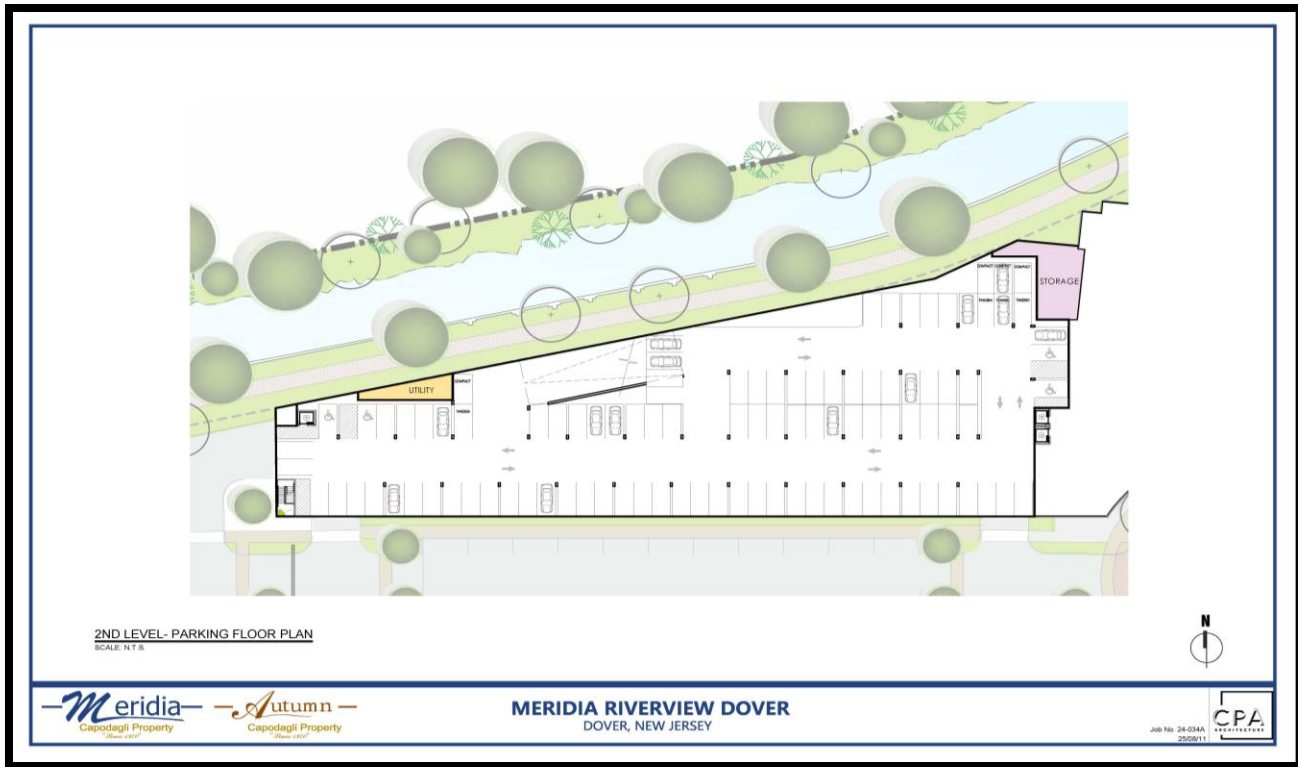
Conceptual Site Plan Building Phase 2: Below Grade Parking Level Typ.
